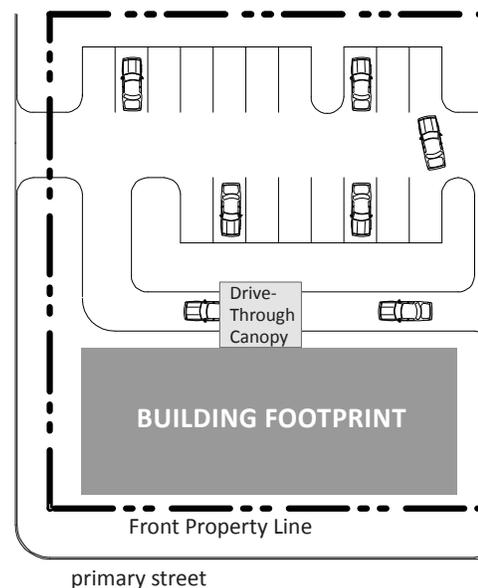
I-1. Recommended Drive-Through Facility Layout.
